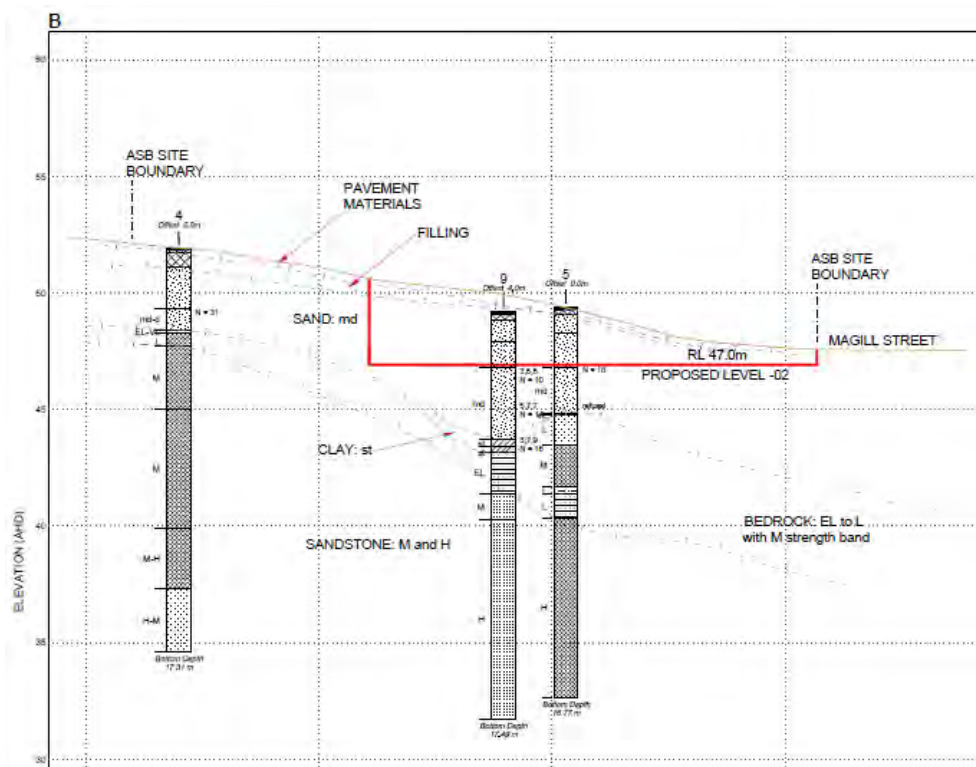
Interpreted North-South Geotechnical Cross Section B-B showing fills levels below existing ground surface in BH4, 5 & 9 along Eurimbla Avenue between High and Magill Streets. Source: Douglas Partners 2018: Appendix B: 2.
